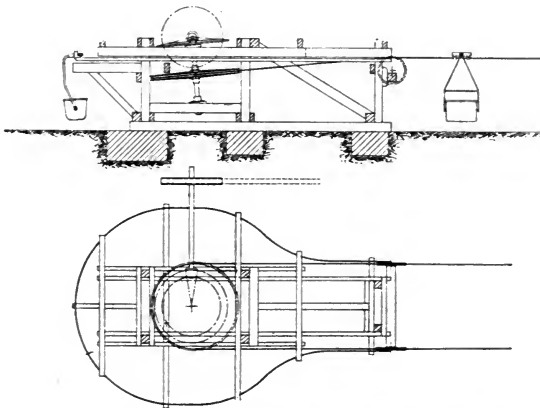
PLAN AND ELEVATION OF DRIVING STATION.
